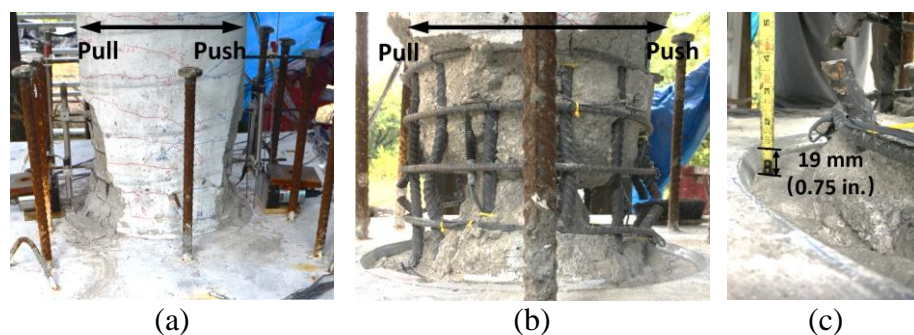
Test Observations: (a) damage in column, (b) column base at the end of Phase II, and (c) grout spalling
